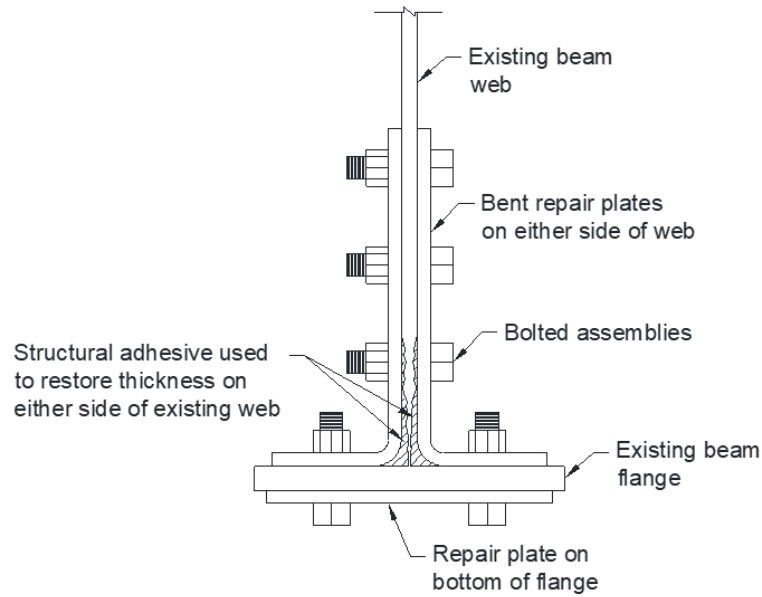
Steel Grouting Example with Structural Filler Used to Restore Thickness on Existing Beam with Bolted Repair Plates
